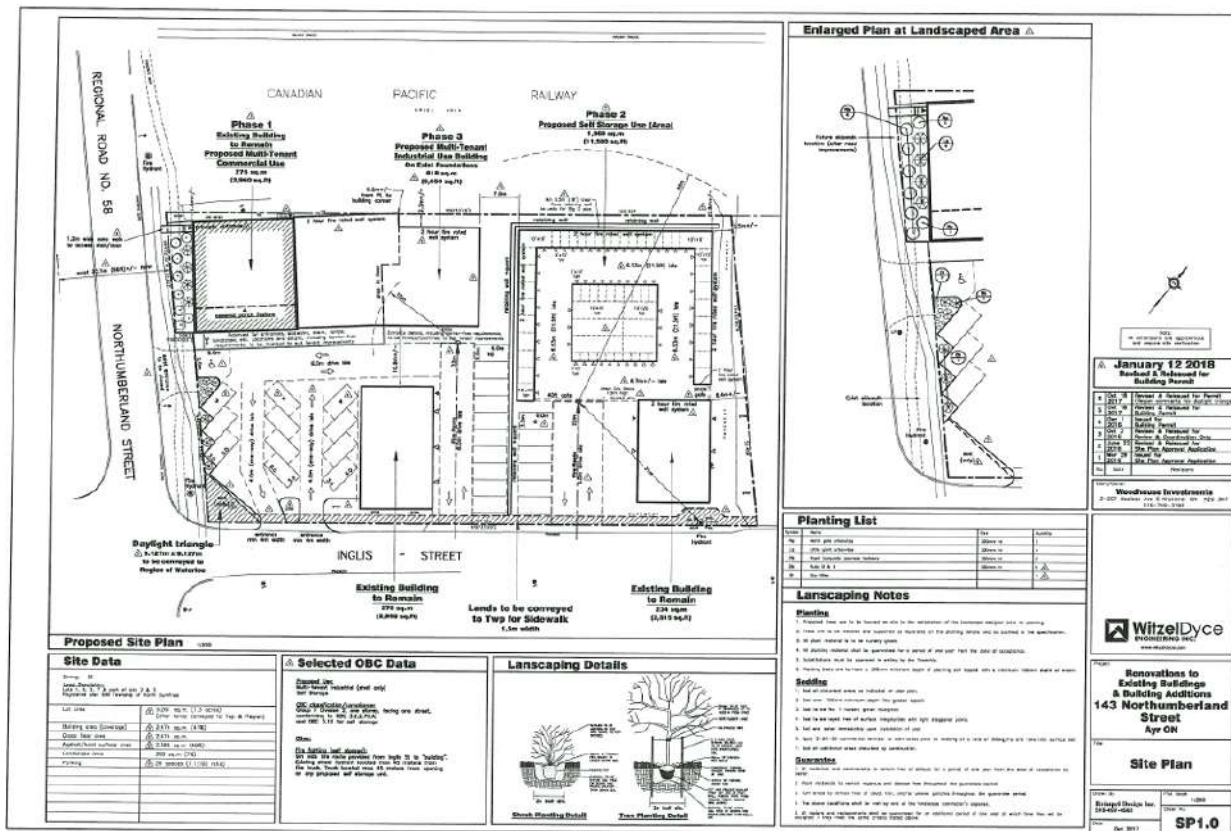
Approved Site Plan of Subject Site (Source: WitzleDyce Engineering Inc.)
